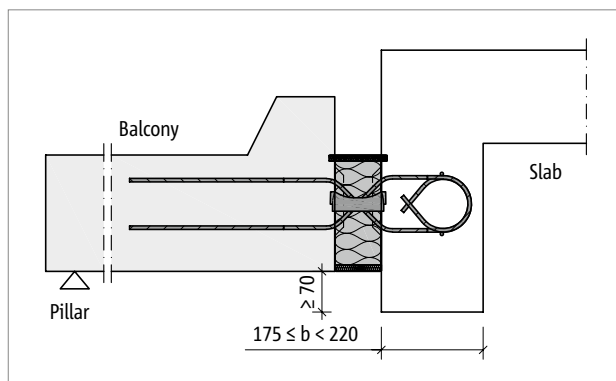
Schöck Isokorb® T type Q-E-W-VV: Installation situation "pre-cast balcony slab" (e.g. T type Q-E-W-VV1 to VV3)
